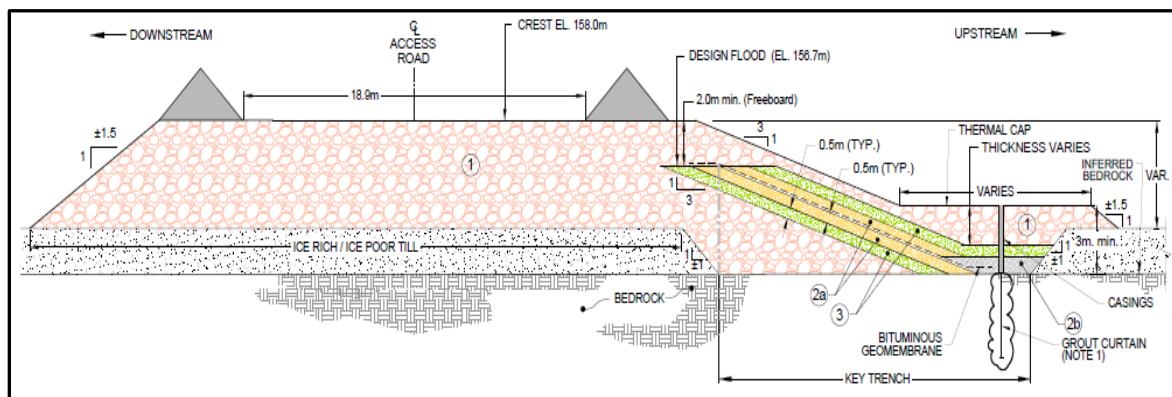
Typical Section of Whale Tail Waste Rock Storage Facility Dike
